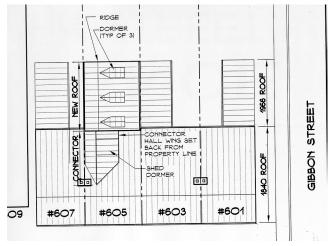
Roof plan showing proposed addition at 605 S. St. Asaph Street
